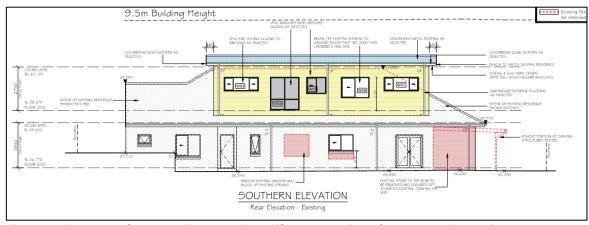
Proposed Southern Elevation Plan (Sydney Drafting Concepts & Design).
